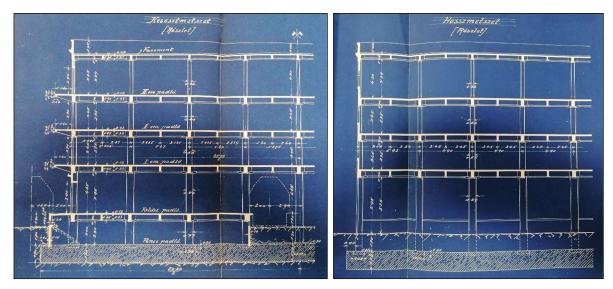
Transversal (left) and longitudinal cross sections (right) [5]
